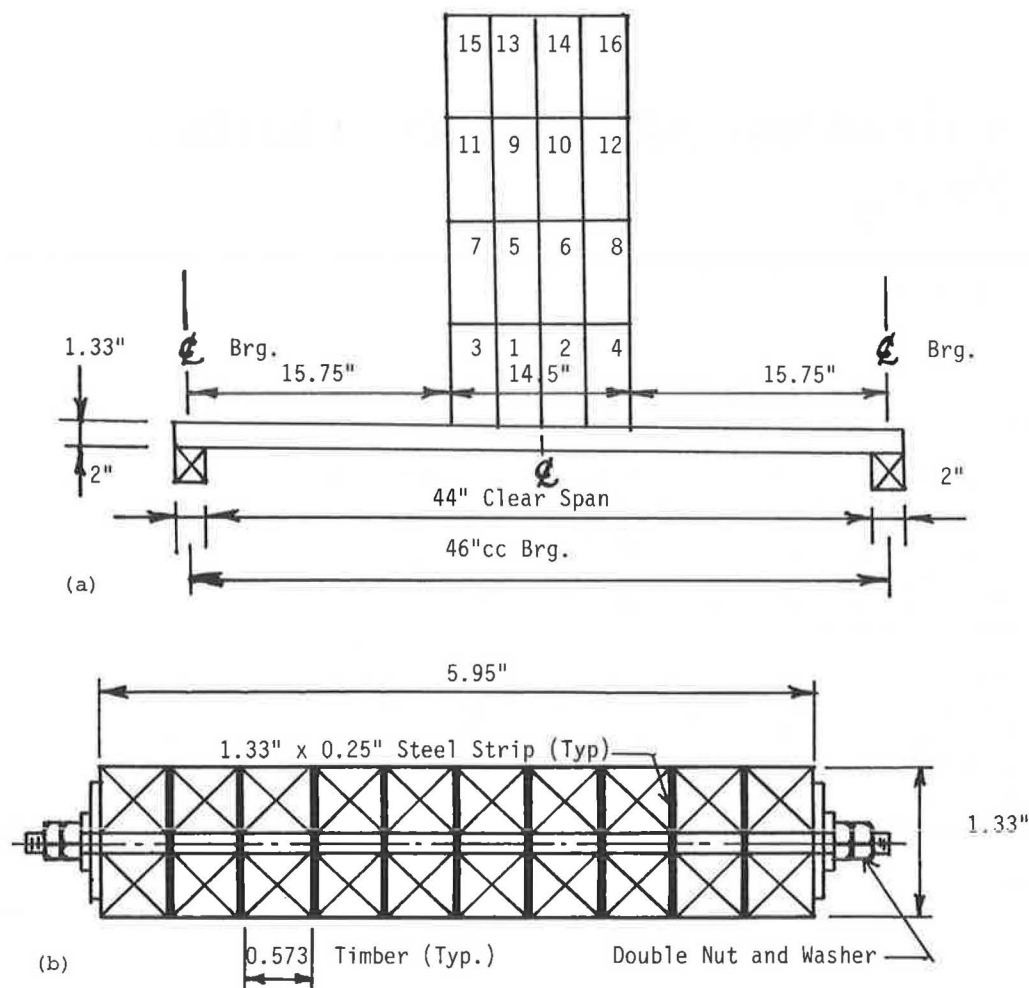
(a) bilayer model bridge with 16 concrete blocks; (b) bilayer model bridge cross section with 20 timbers and nine steel strips.
